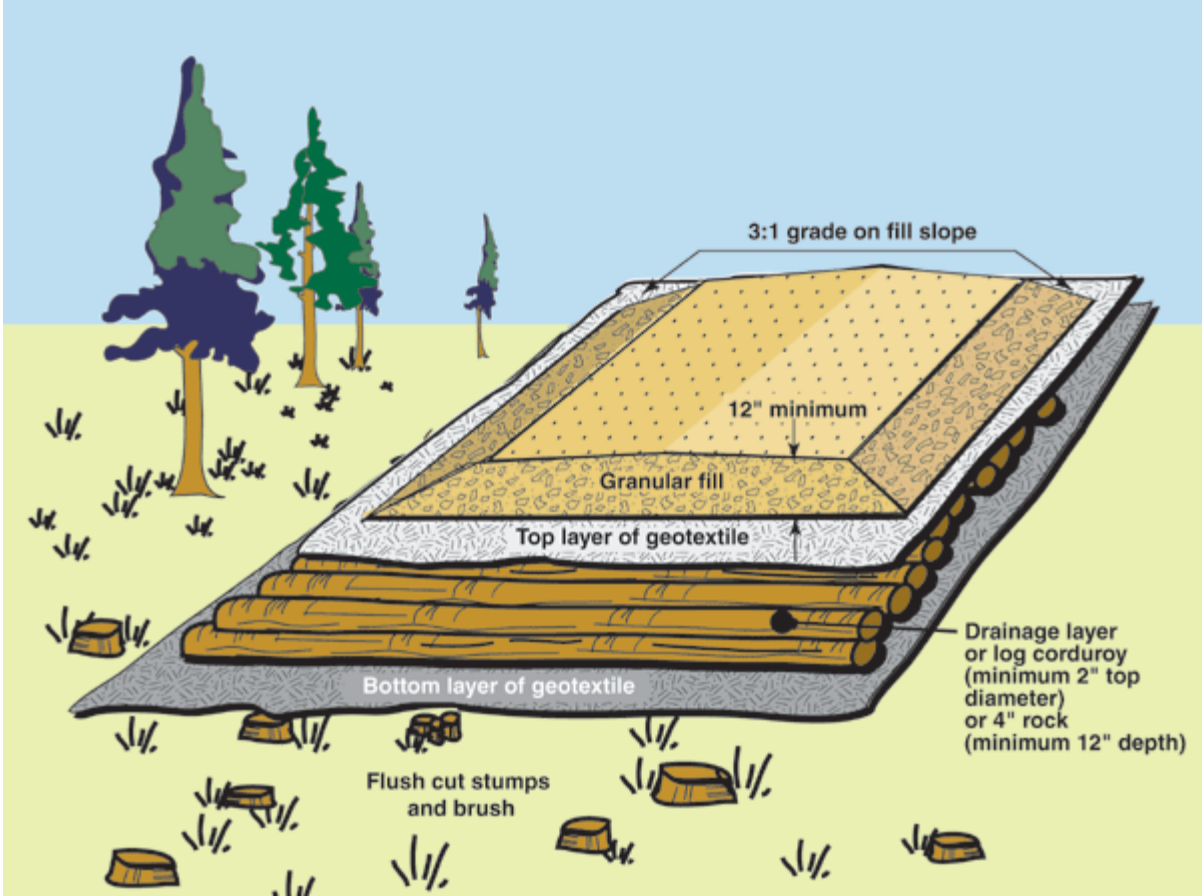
Road design for peat wetlands with continuous cross drainage. drainage layers may be used as an alternative to culverts, or in combination with culverts, to provide adequate cross drainage.
